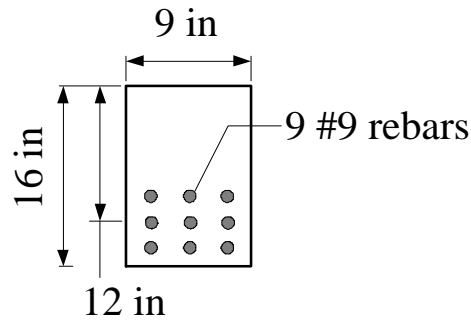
Section dimension and arrangement of longitudinal reinforcement steel rebars for section UHP/St60 16R-2
